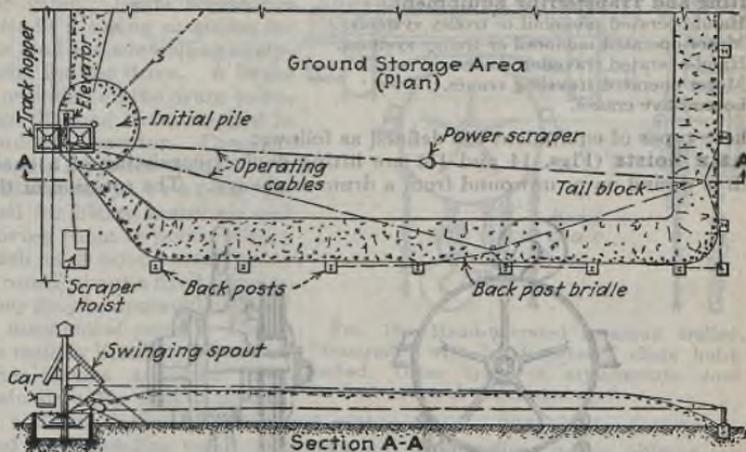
Layout of storage yard with drag-line scraper installed.
